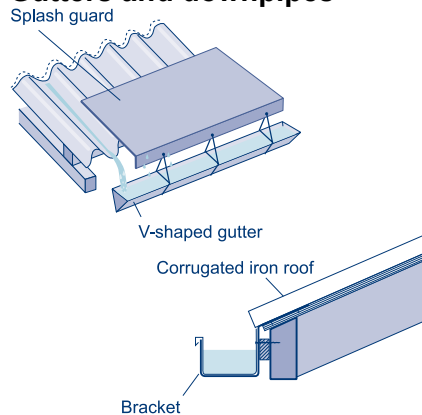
Examples of V-shaped gutters and splash guards, and other gutter systems (adapted from Gould and Nissen-Petersen, 1999)
